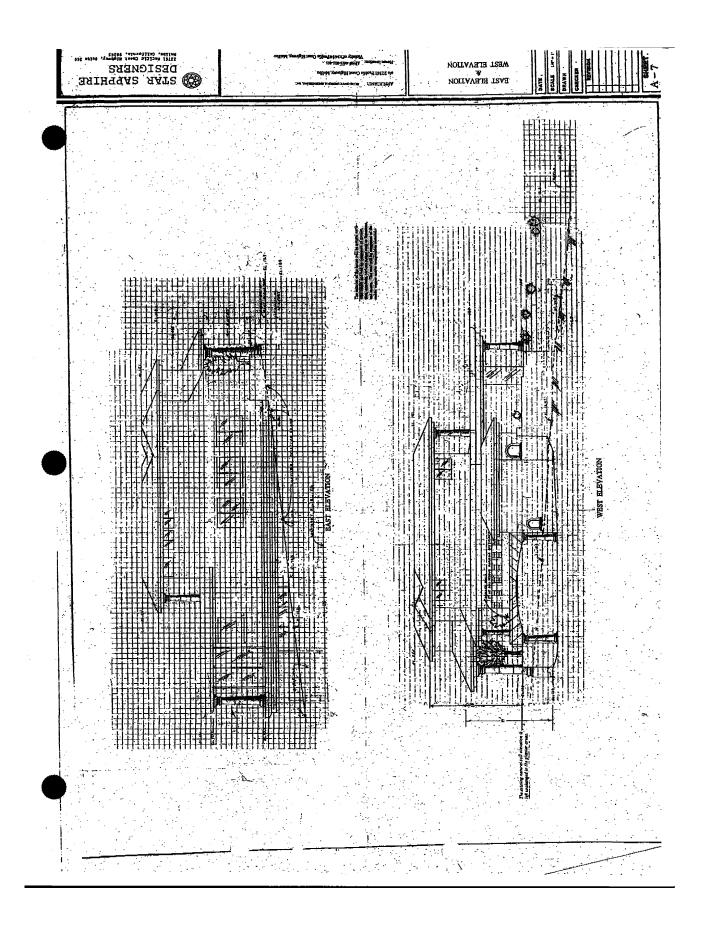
A-4-MAL-05-164 East and West Elevations
